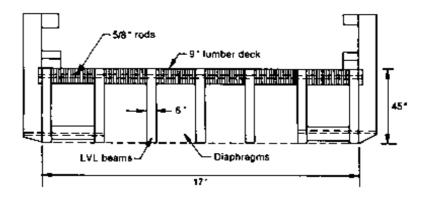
Drawing of a stress-laminated T-bridge cross section.
